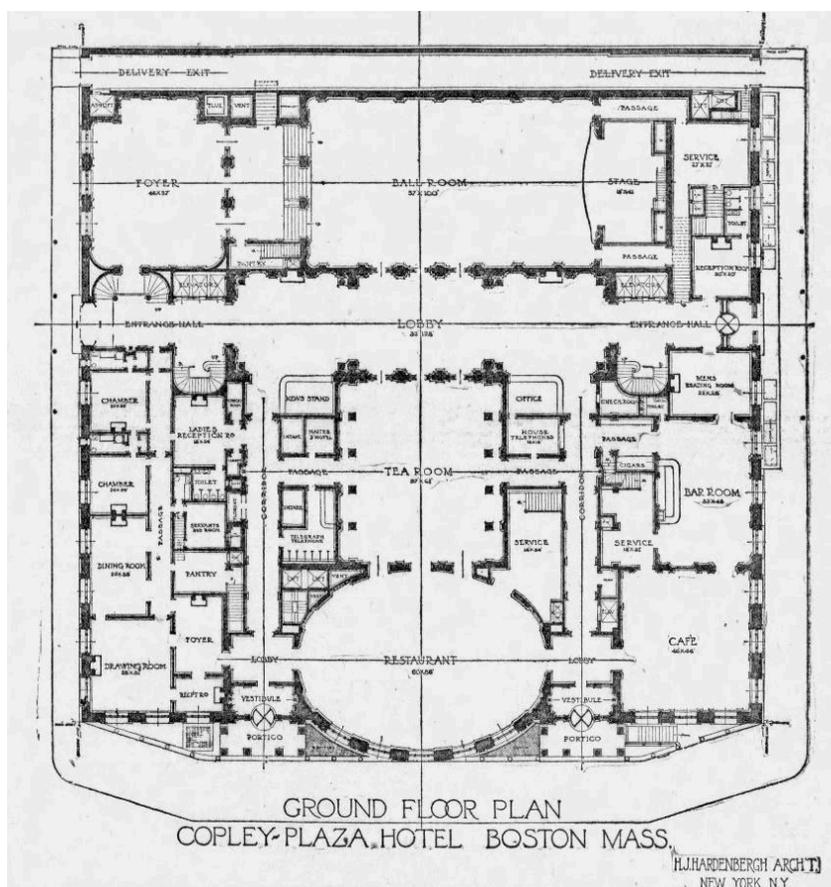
Architect Henry Janeway Hardenbergh's Ground Floor Plan drawing of the Copley Plaza Hotel, 1911.³
